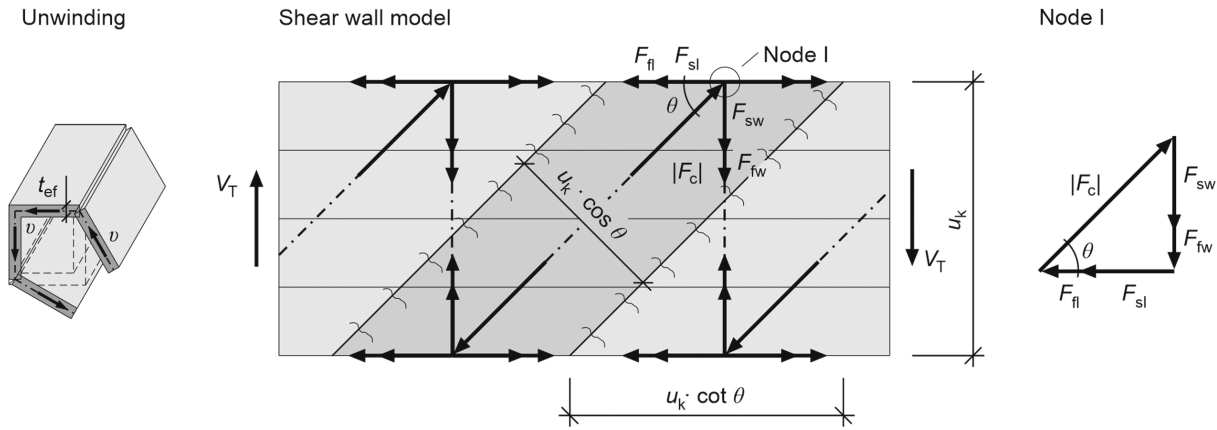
Unwinding (left), plane shear wall model (center), and force polygon for node I (right) of steel fiber reinforced RC beams (SFR-RC beams)
